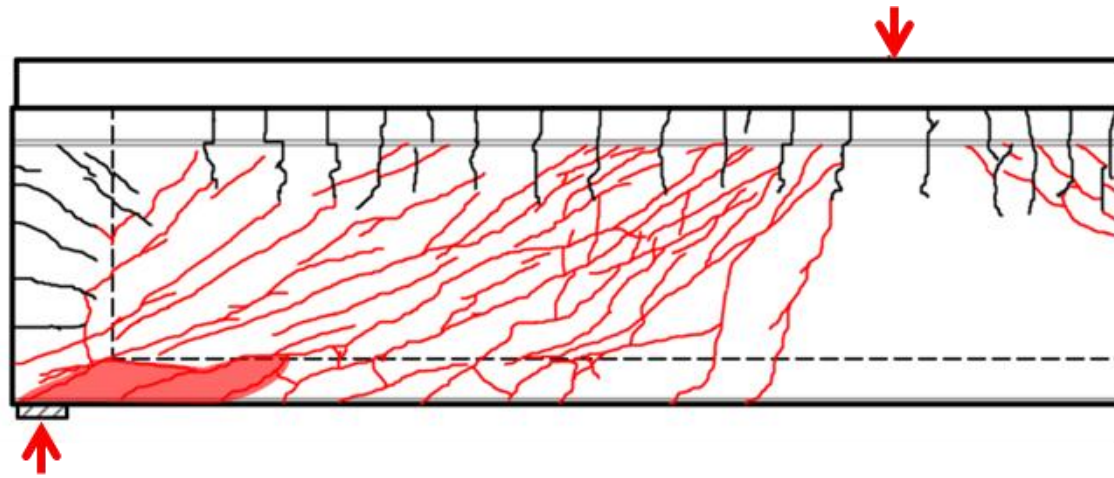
Beam 2 North, Web-to-Flange Interface Failure Crack
